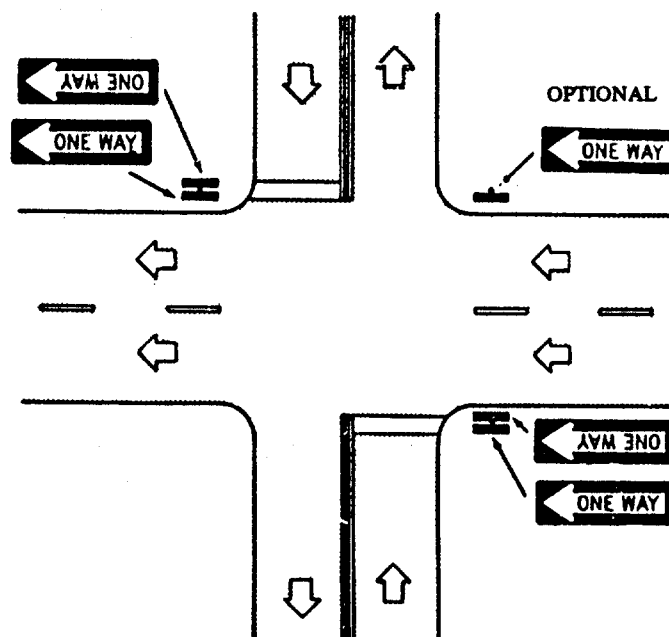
Recommended location of ONE WAY signs for intersection of a one-way and two-way street. Source: Crowley and Seguin, 1986.
